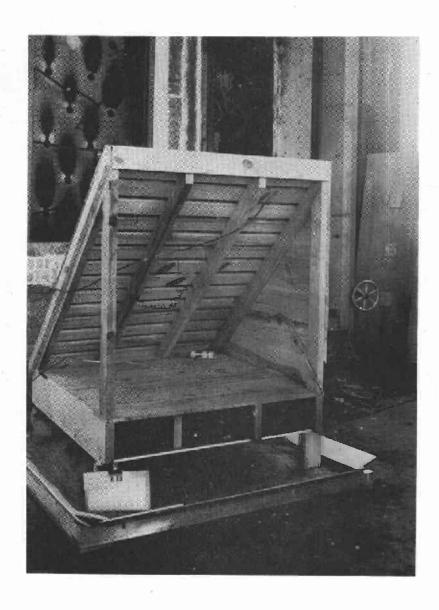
Roof-corner flame spread test. Ignition is by magnesium bomb.
